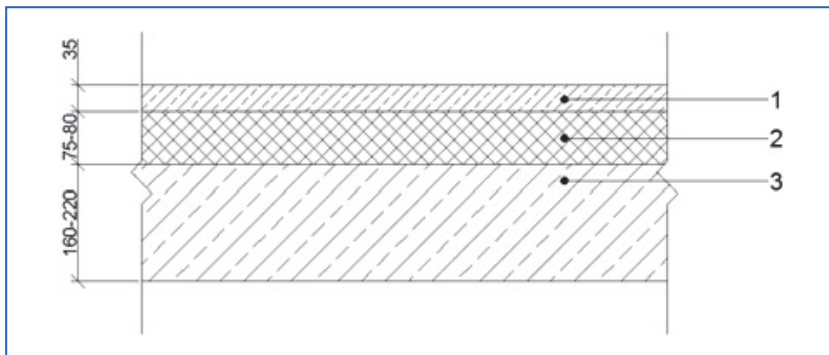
Floor construction "V-type". 1) sand/cement screed, 2) compound from recycled styropor granules, 3) reinforced monolithic concrete slab.
